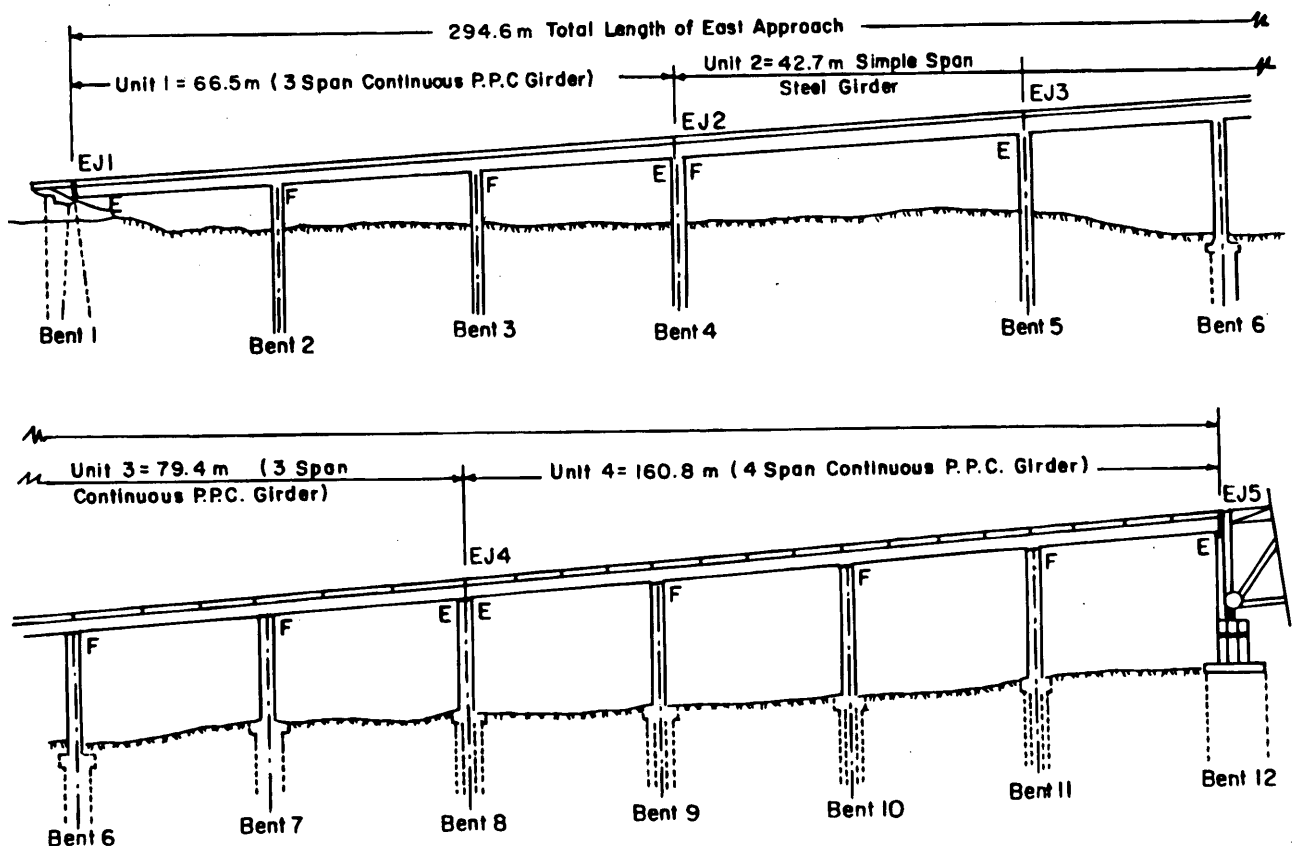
North elevation of east approach, US-90 bridge at Krotz Springs, Louisiana.
